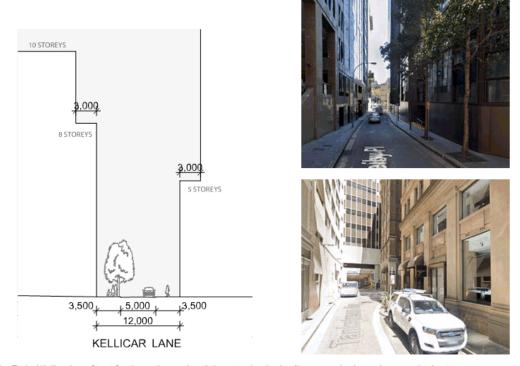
Typical Kellicar Lane Street Section and examples of character showing loading areas, planting and some active frontages - Tanksteam Way and Reiby Place, Sydney
